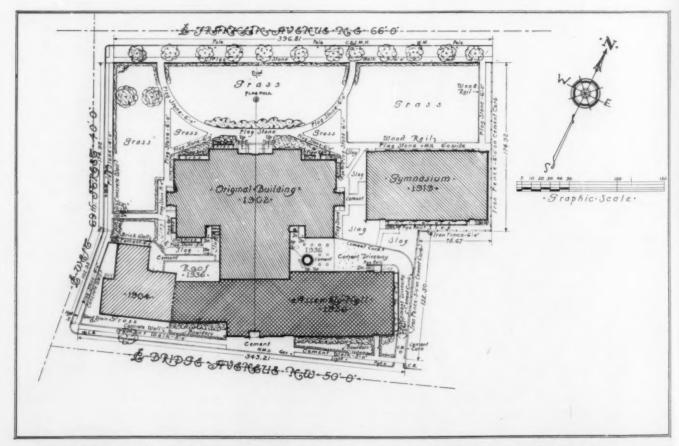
Plot plan of West High School site, showing the location of various units, including the modernizing addition in 1936
